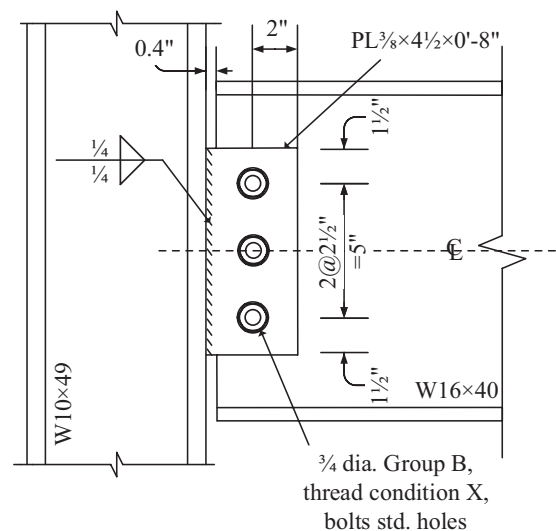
Detailed design for W16×40 beam connected to W10×49 column through a single-plate connection.
